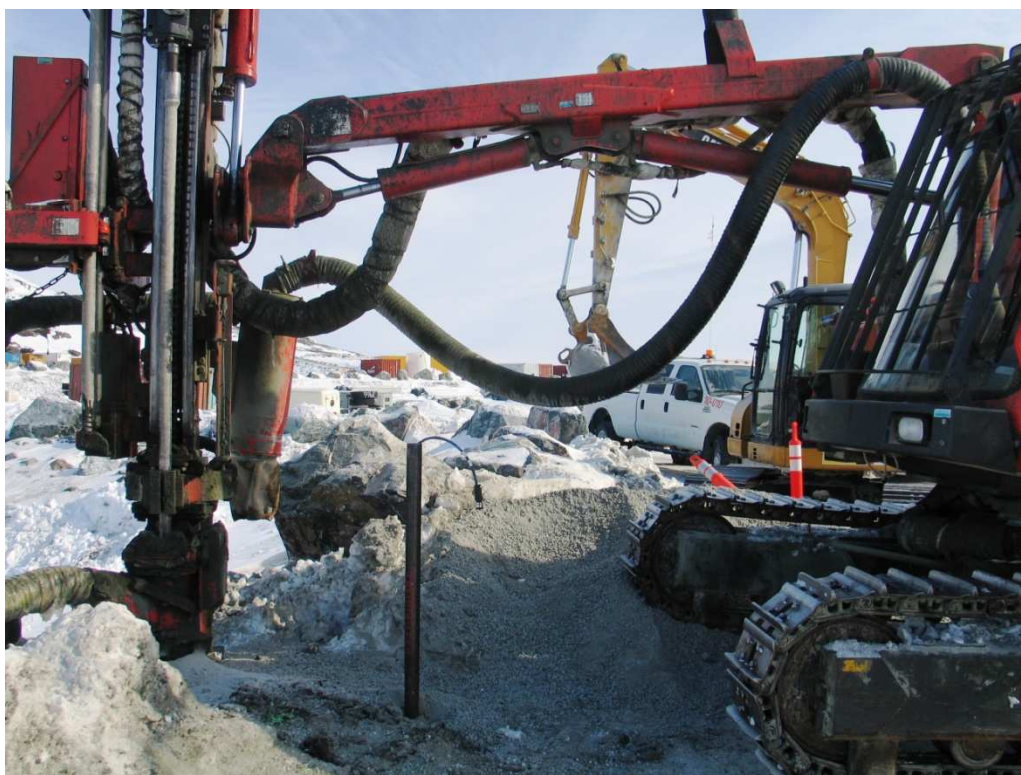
Drilling a 2 foot hole. Cable was ~ 1 meter short.
